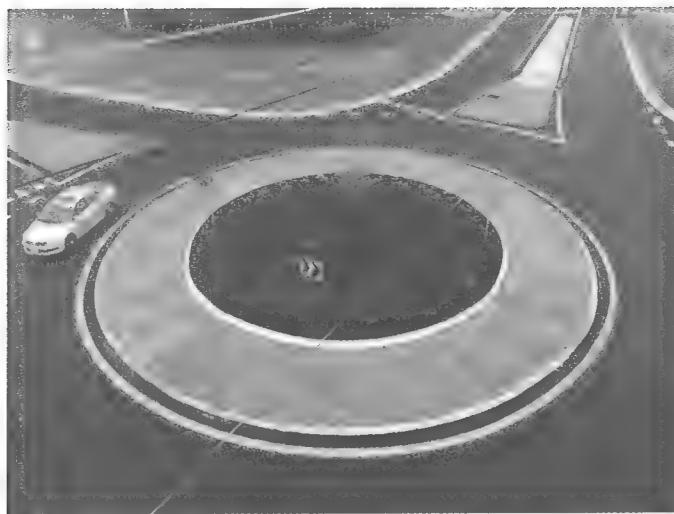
Braddock Road–Pleasant Valley Roundabout (Source: Virginia Department of Transportation).
